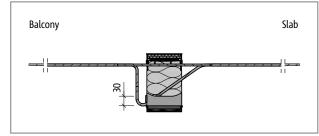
Schöck Isokorb® XT type K-M5, K-M6: Product section
